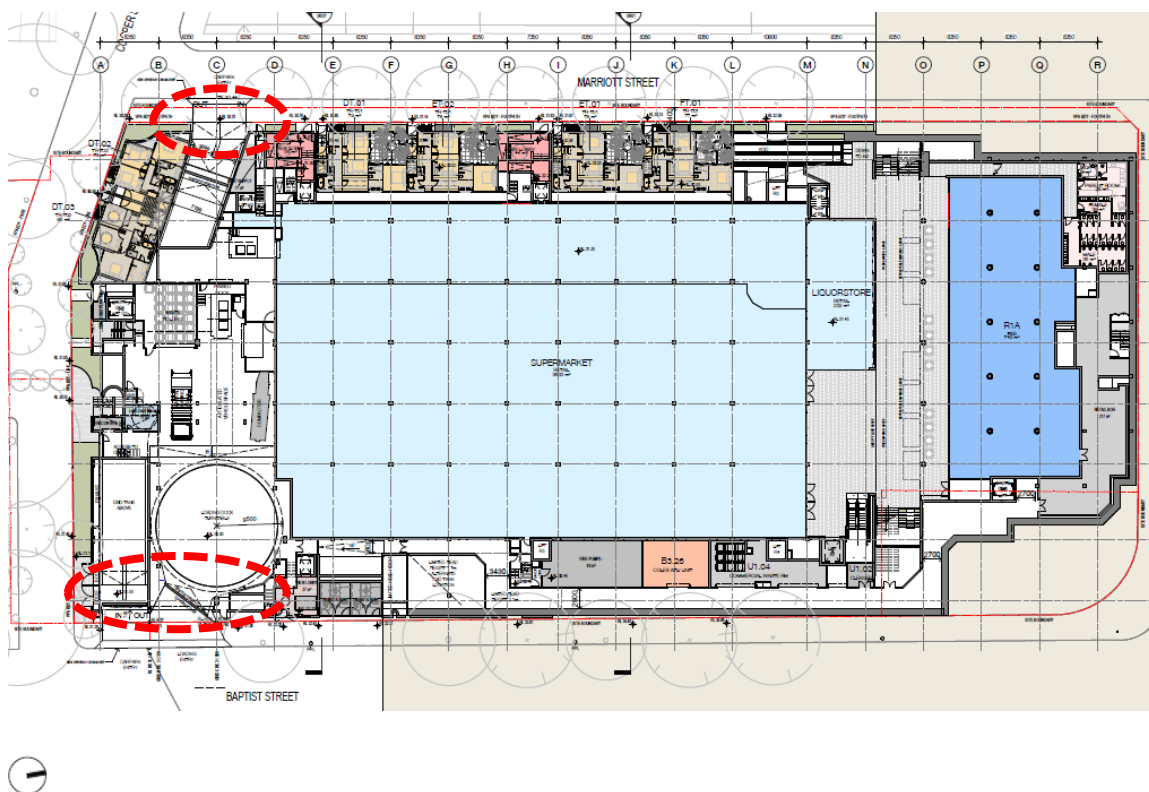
Proposed basement level 01 plan depicting car park and loading access to the site
